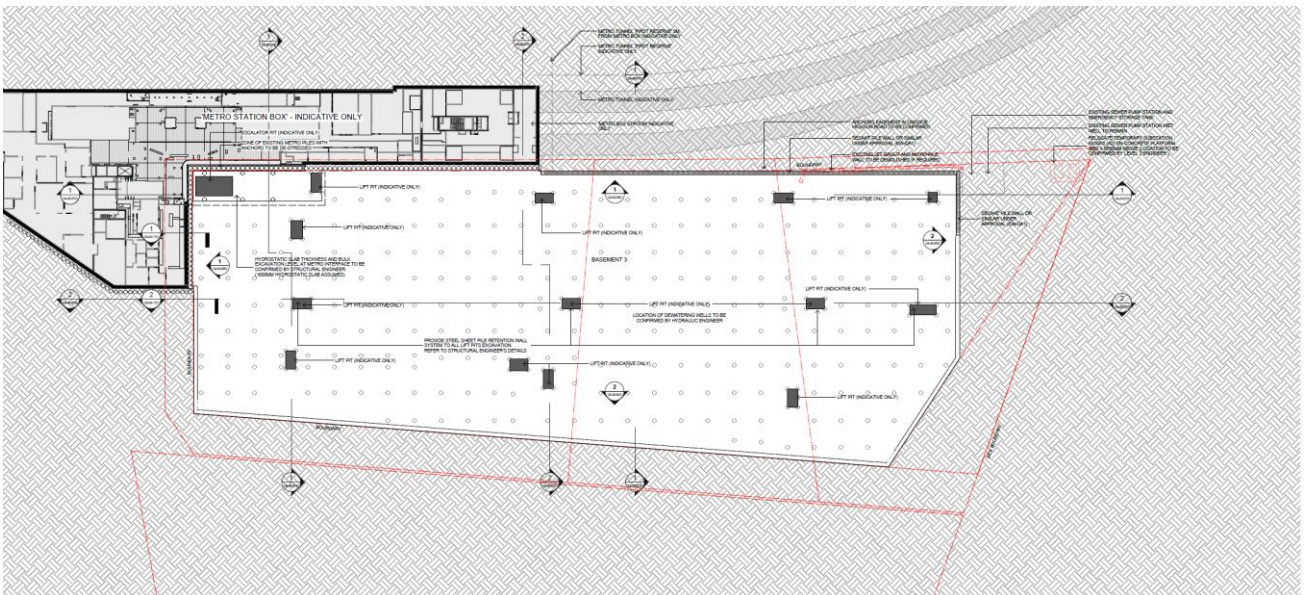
Early Works Stage 2 - Perimeter Retention Wall Plan.
